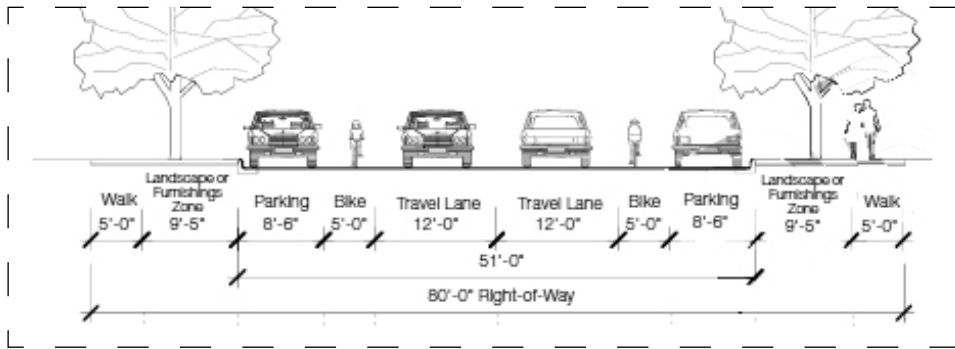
SECTION FROM EBURD CODE FOR 10TH STREET NORTH
